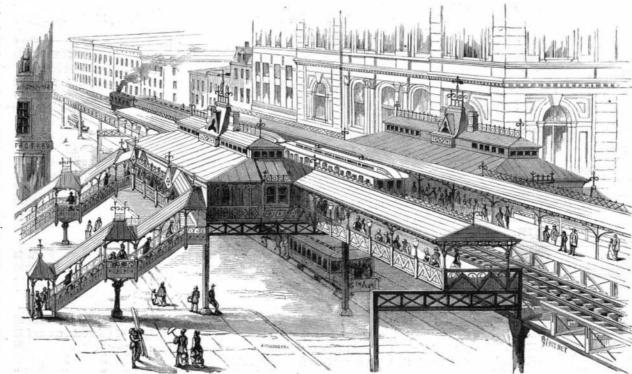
ELEVATED RAILROAD STATION, 23D STREET, NEW YORK
